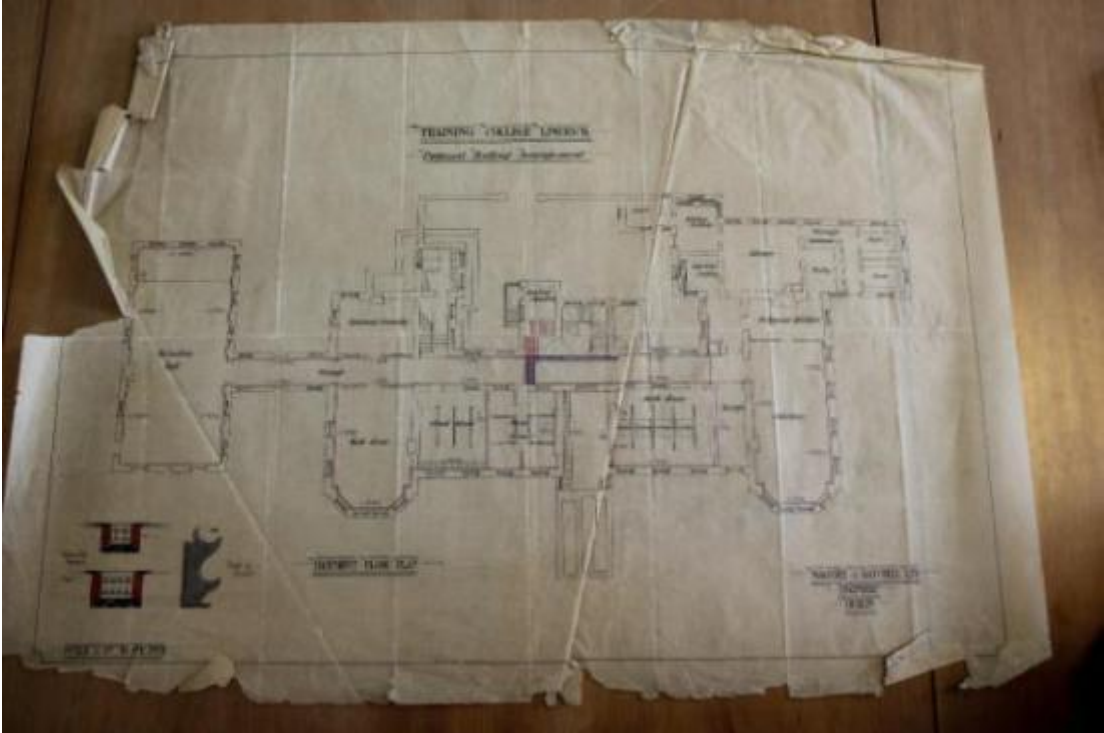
Proposed heating drawing showing Foundation Building with Recreational Hall adjoining – Irish Architectural Archive
